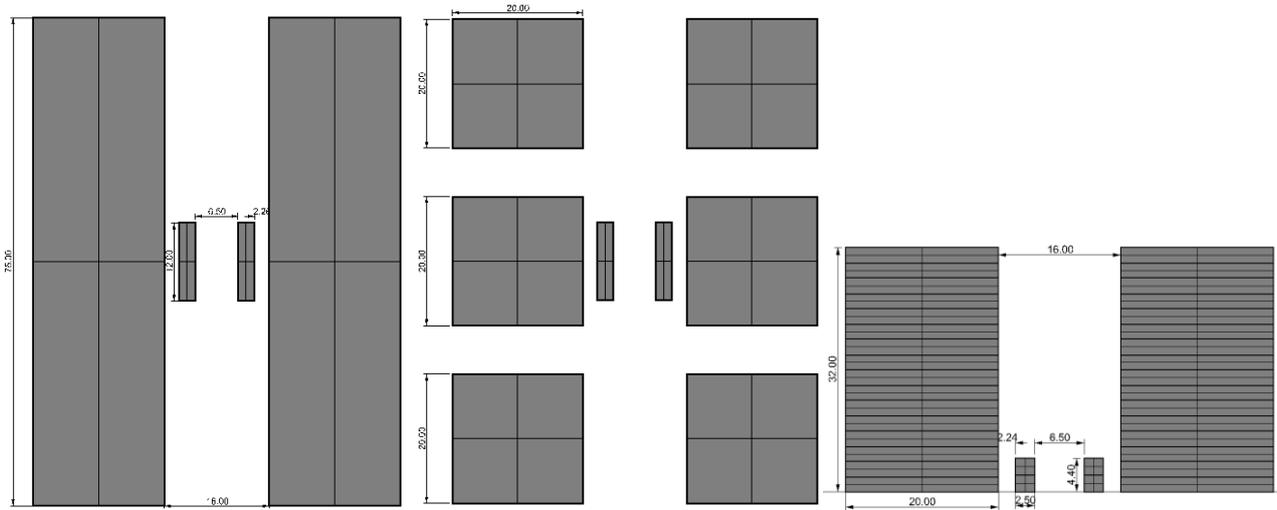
Slab (left) and point (center) typologies in plan and elevation (right).
